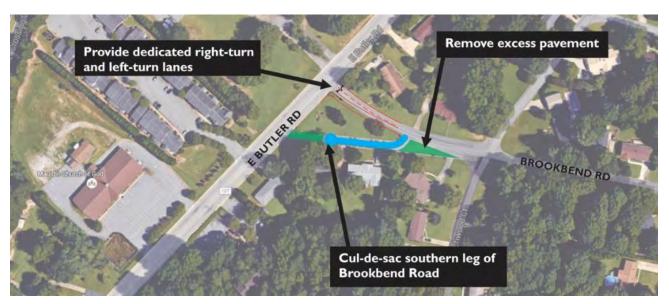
East Butler Road at Brookbend Road Recommended Improvements
